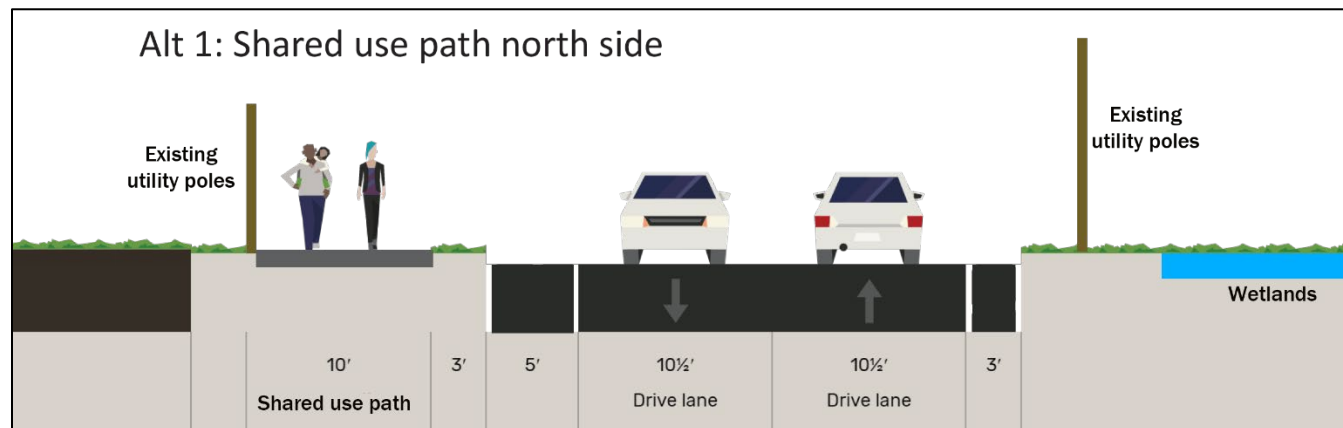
Segment E (and Segment F west of Cedar Avenue), Alternative 1, looking east.
